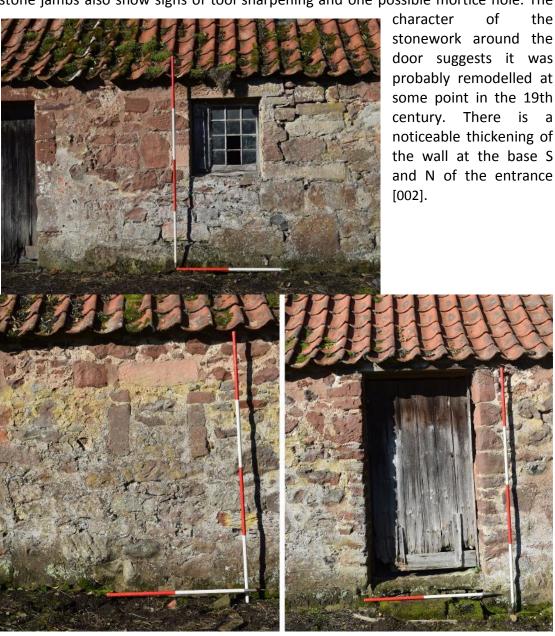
Structure 5, E elevation (partial) with window [003]; blocked opening [004] and entrance [005].
